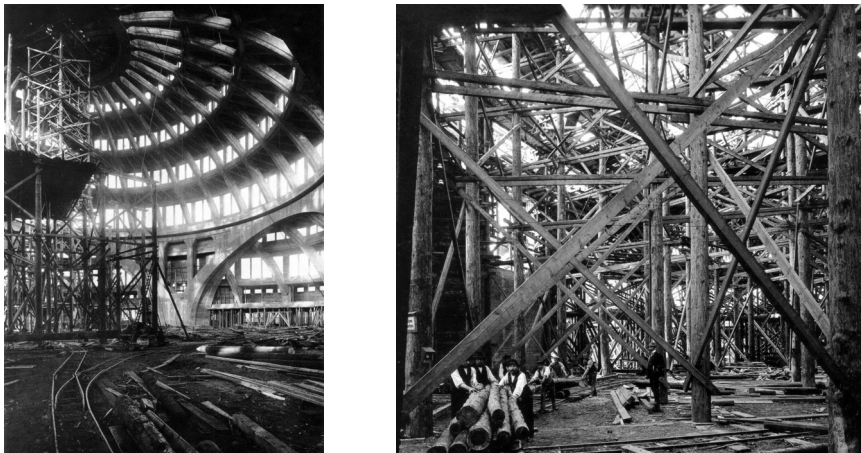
Scaffoldings and formwork during construction of the Wroclaw Dome
